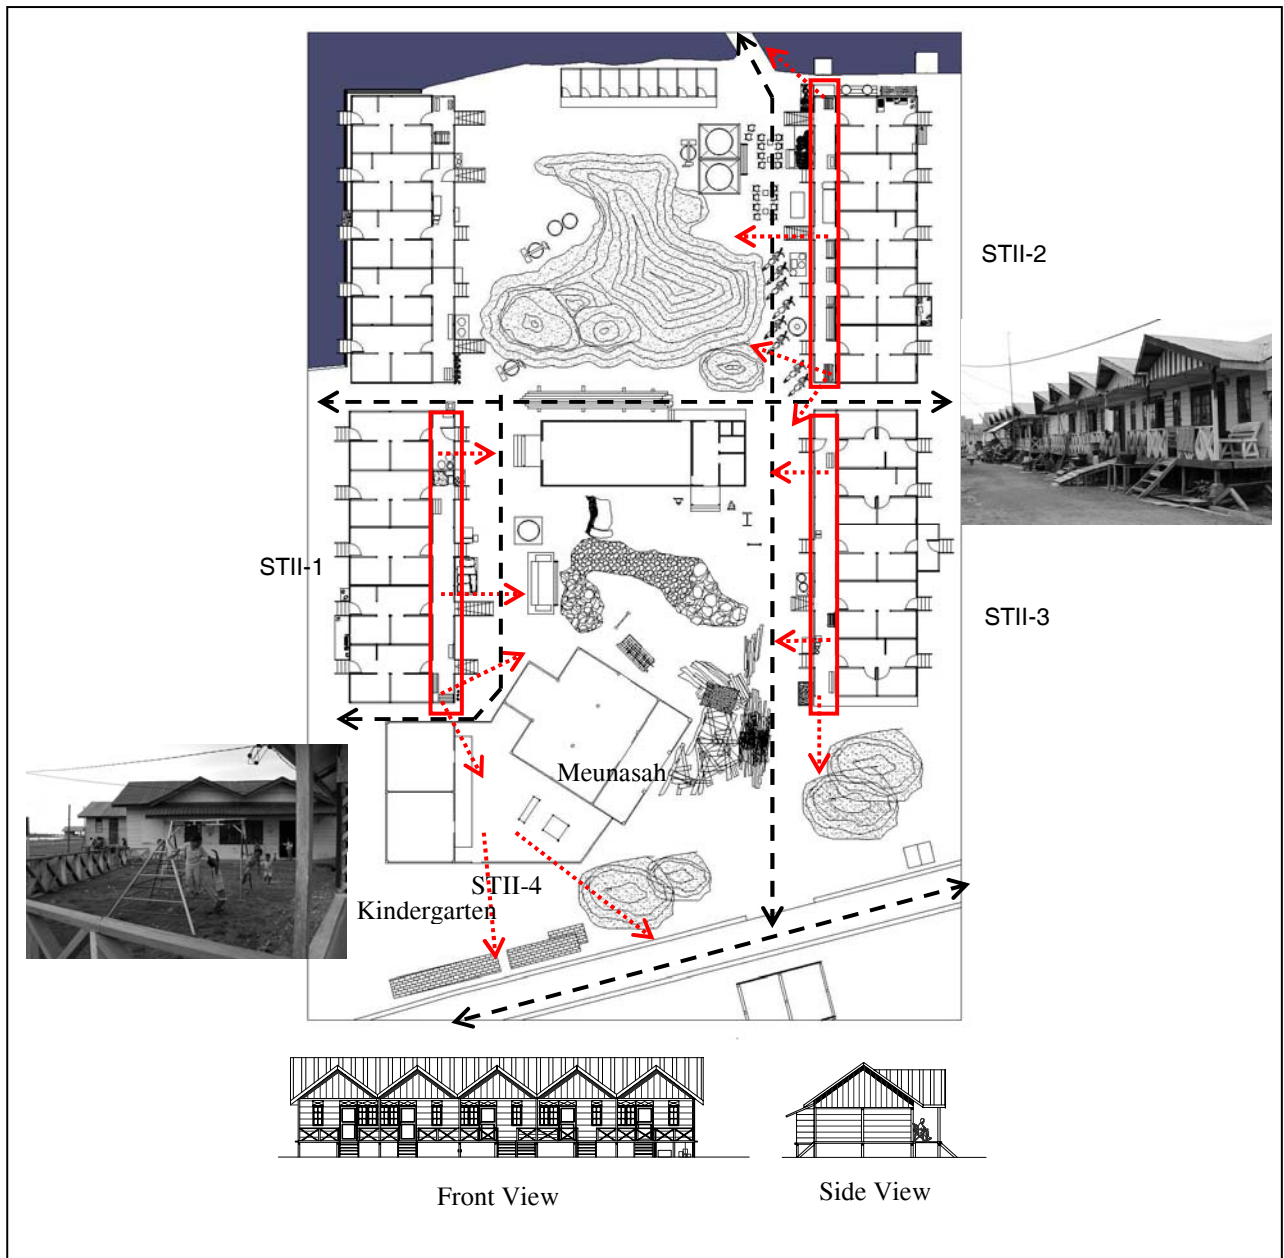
The Single-Building Shelter [ST II-1, 2, 3] & Kindergarten [ST II-4]
